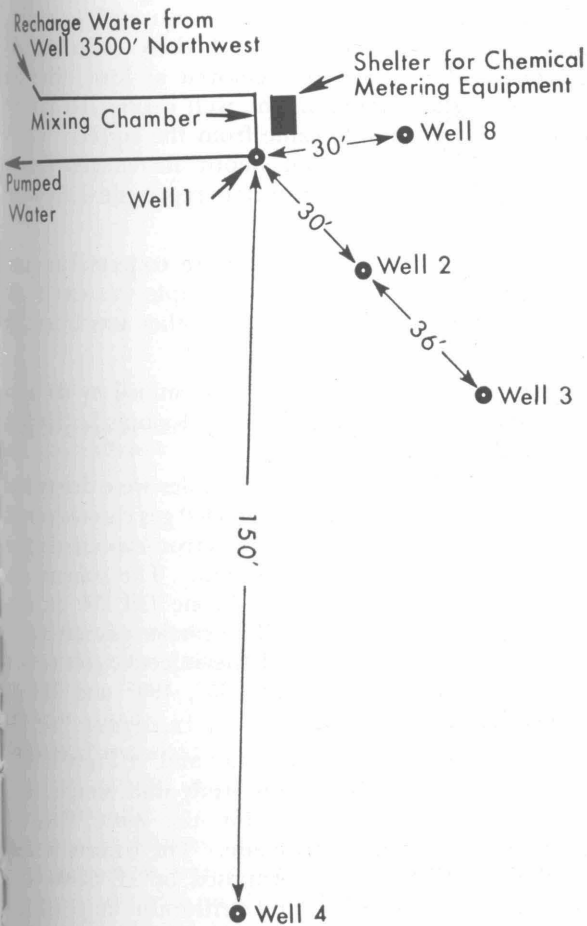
Plan view of the experimental wells used for ground-water sampling and the recharge equipment.
